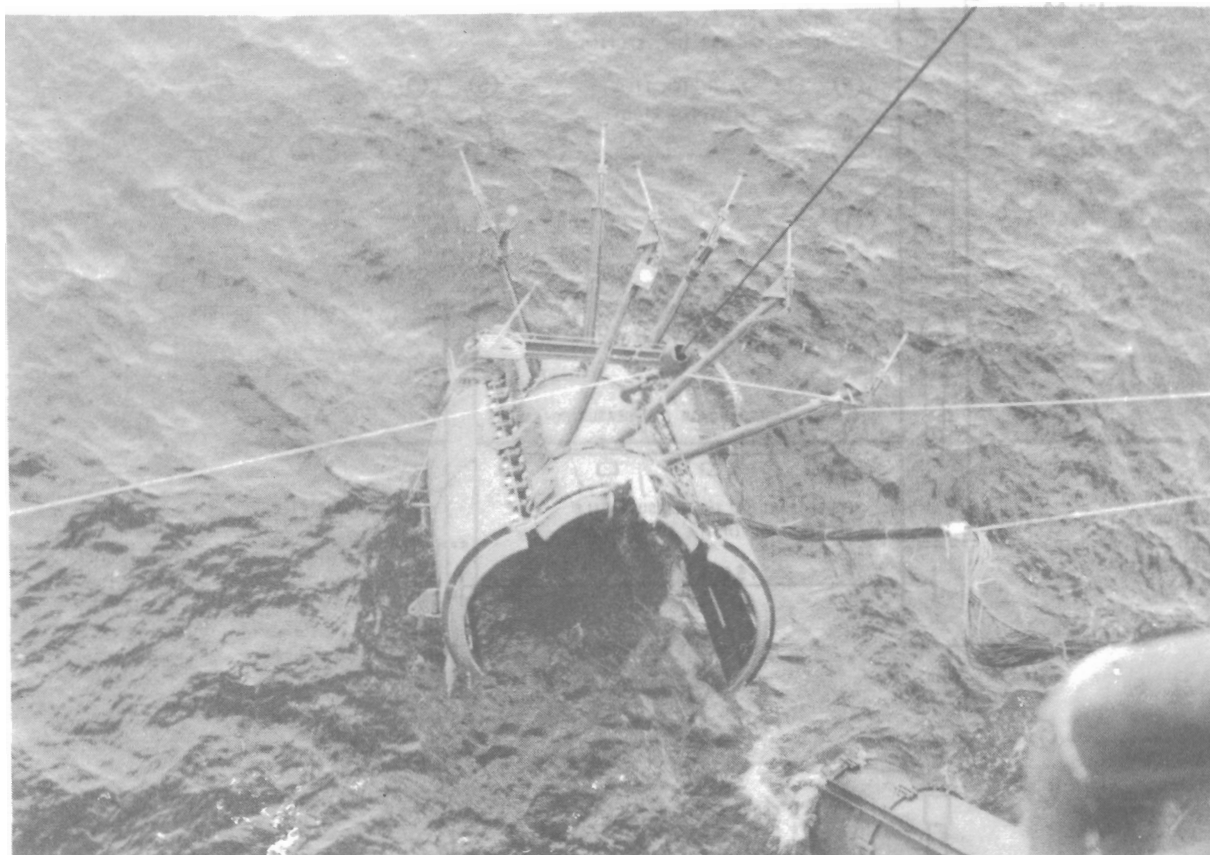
LOWERING PROCESS AND INSTALLATION OF THE TEST SECTION. 1.92 m-DIAMETER PACKING RING CONTAINING 24 PRESSURE TRANSDUCERS AND 8 TWO-COMPONENT CURRENT METERS FIXED TO CANTILEVERS
